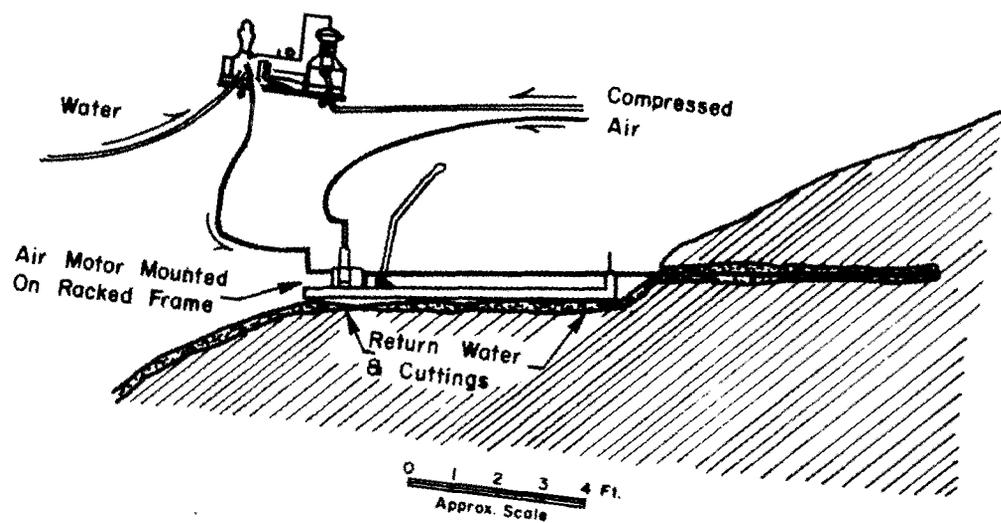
Schematic of hydrauger drill for drilling horizontal drains (after Smith and Stafford, 1957).
